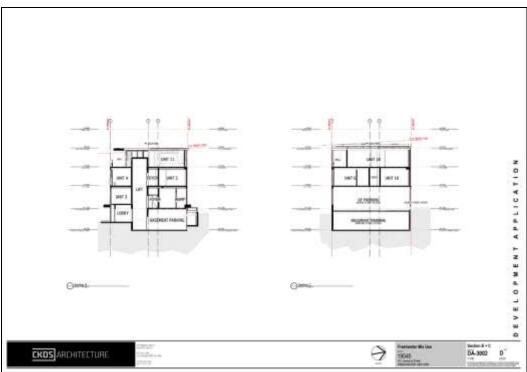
Illustrates Revision D proposed Sections, pages 17 to 19.
